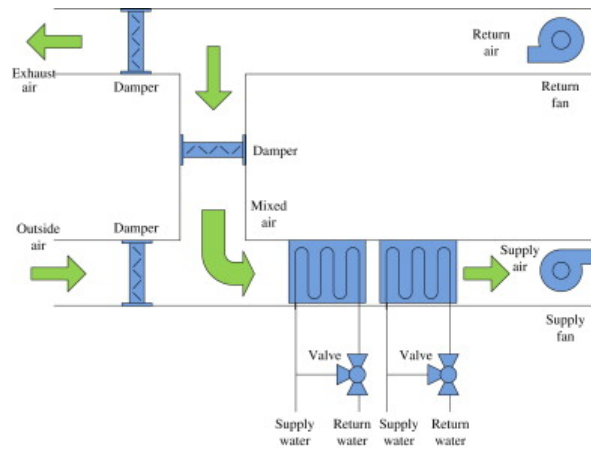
Single Zone VAV System -Air Handling Unit level [3]
